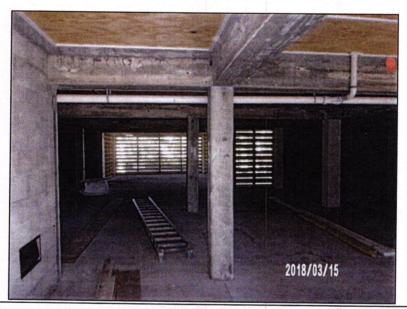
PHOTO FIVE CAPTION: 1"X8" SLAT WALLS WITH 3/4" GAPS (INSIDE VIEW)
